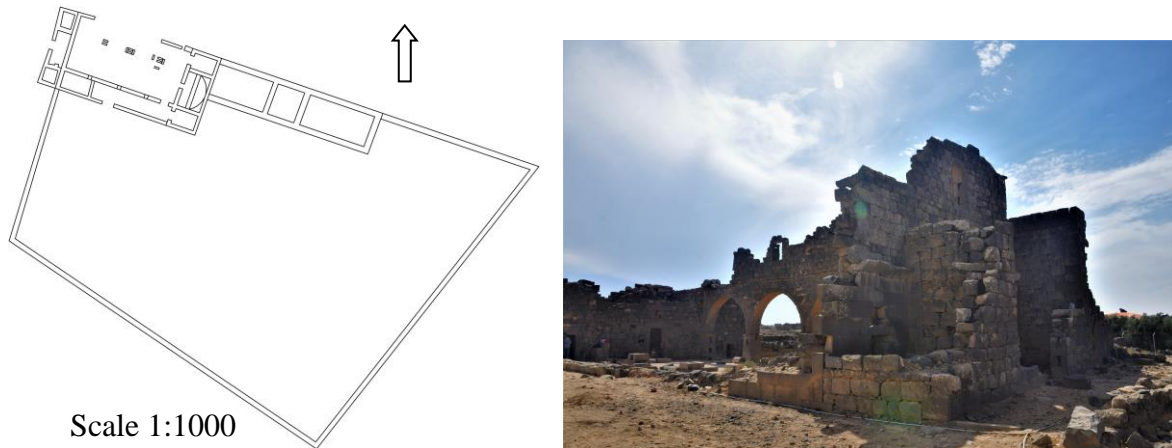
West church two-dimensional plan drawings and photograph. Source: Author
